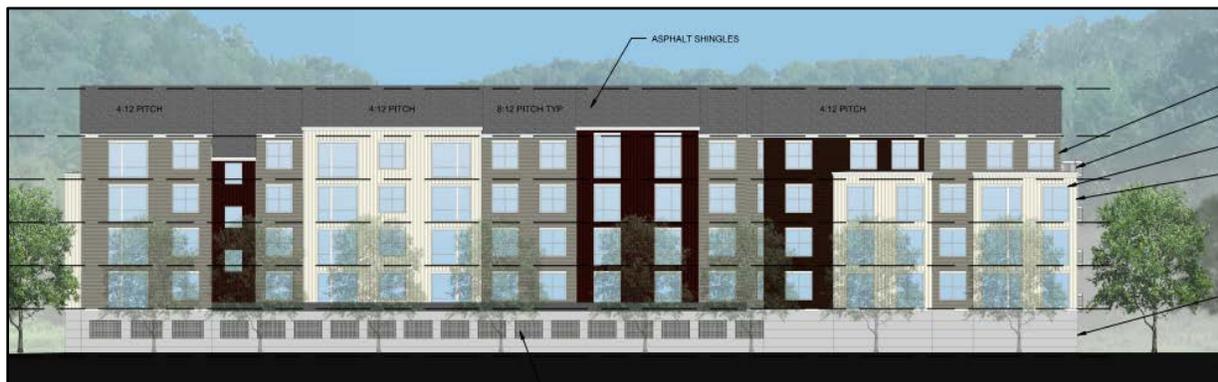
A. Façade of 5-story buildings facing the I-90 Freeway
